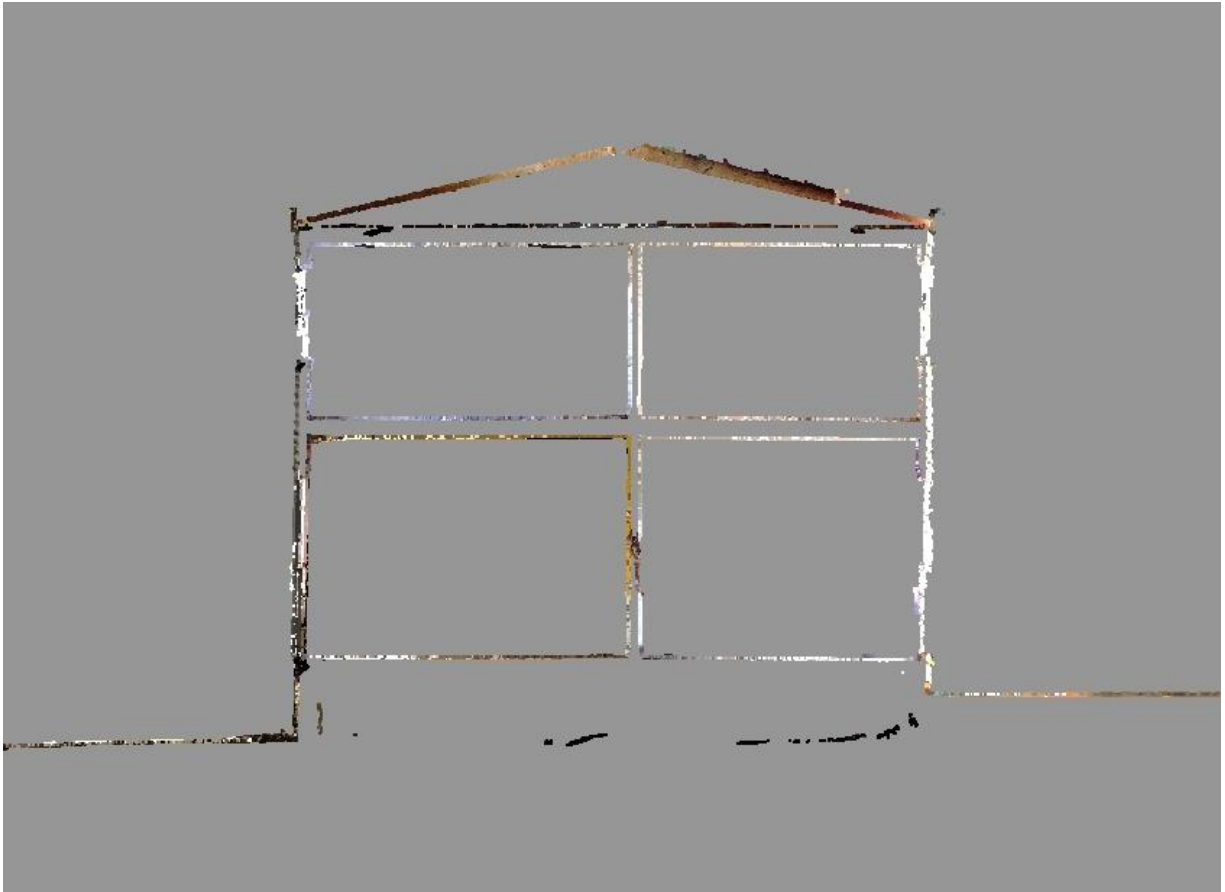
Section view of Campaign One, facing East. In Campaign One the layout of the rooms corresponds to each other between the first and second floor with the rooms being identical in size on the first and second floor.
